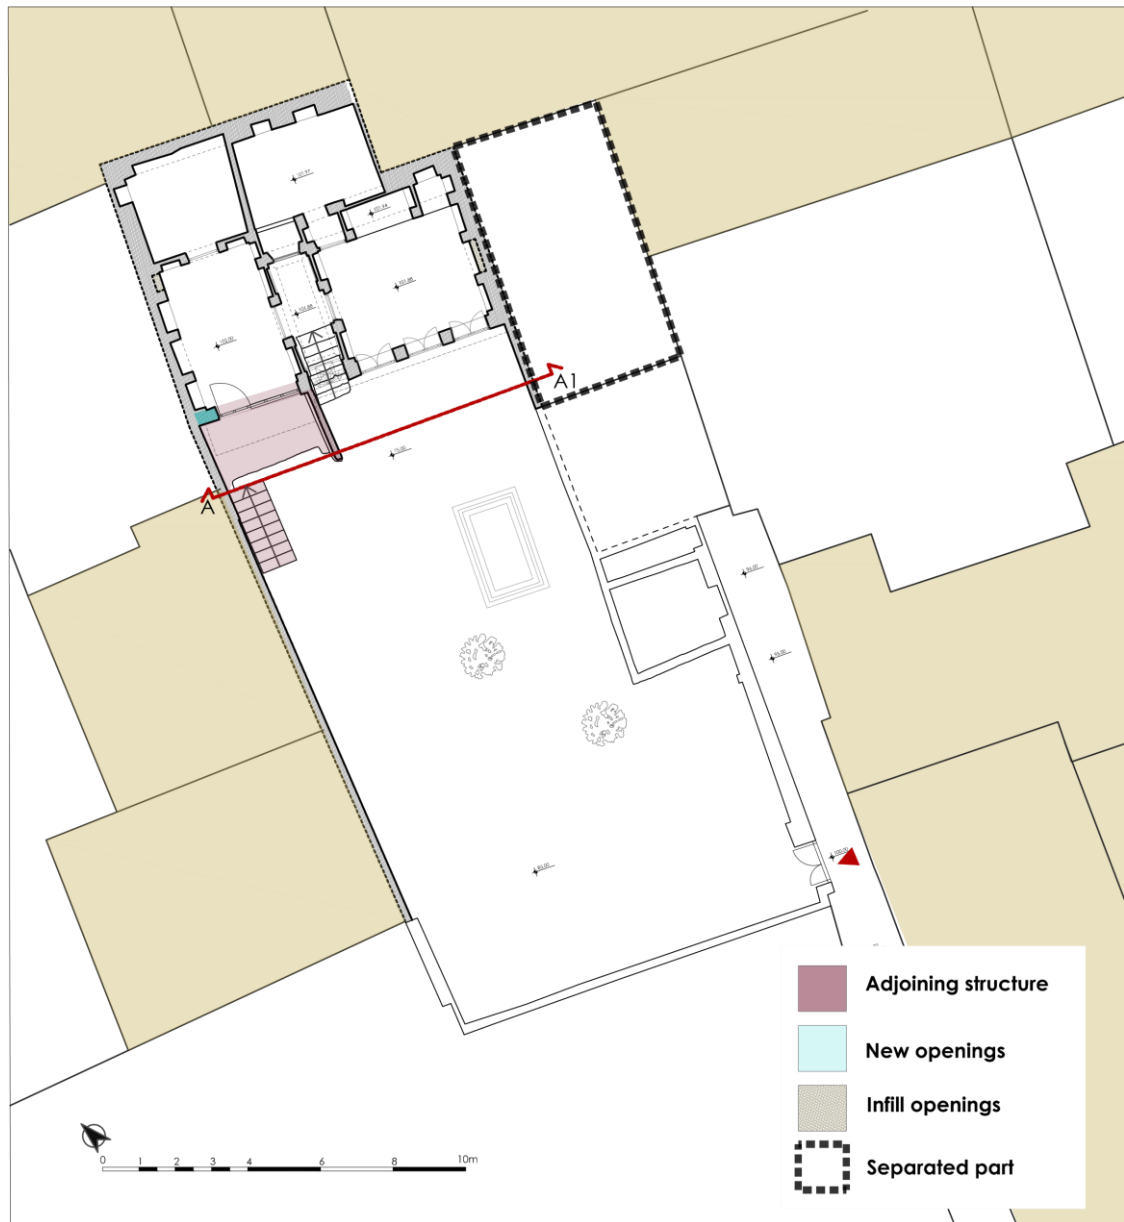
The drawings presents the adjoining structures added to the spaces on the first floor.
